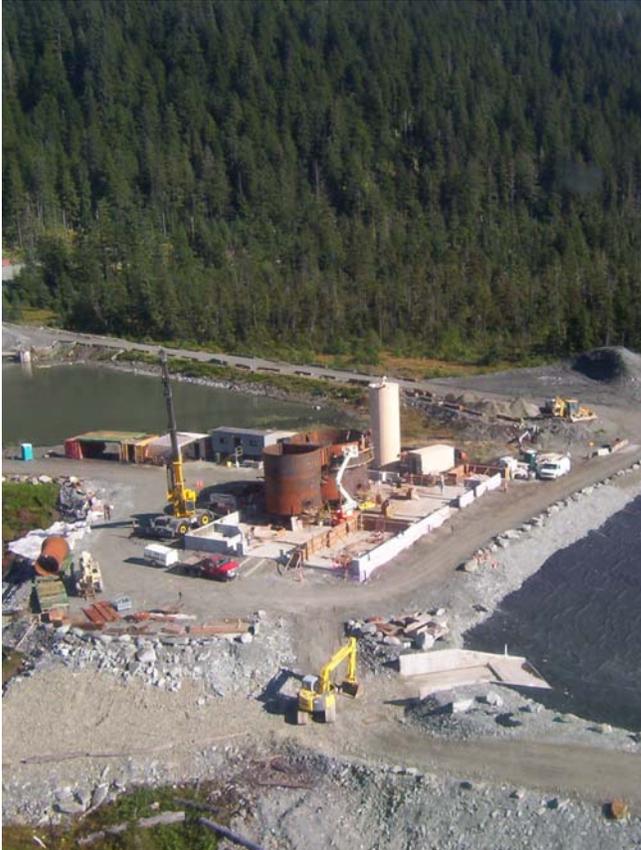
New Pond 7 Water Treatment Plant September 2007
